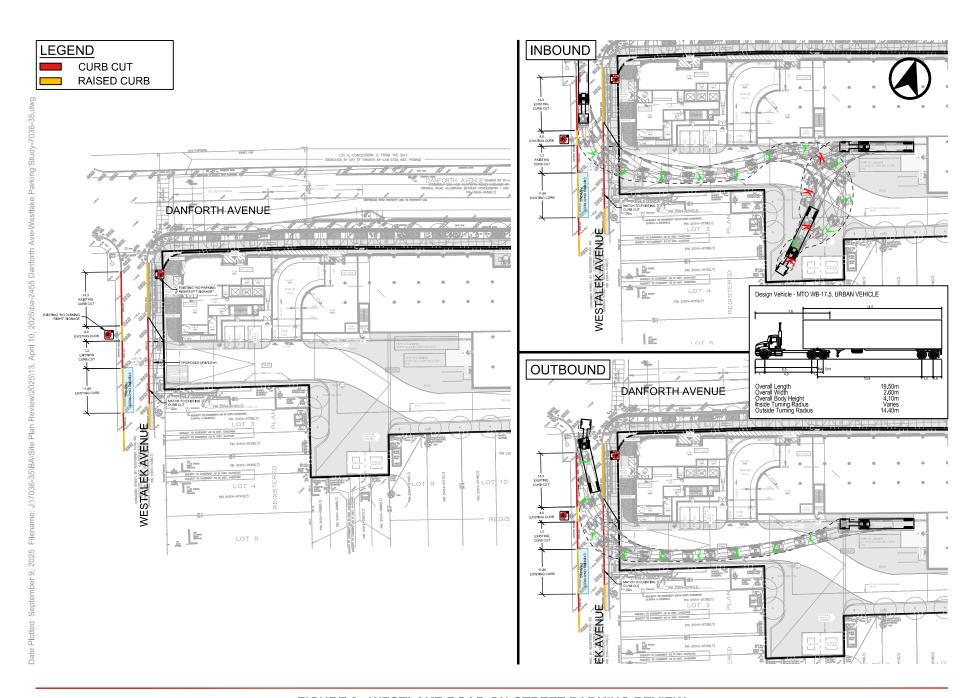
WESTLAKE ROAD ON-STREET PARKING REVIEW
